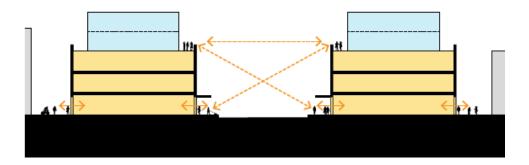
Typical section illustrating how development can respond to and reinforce the role of Oxford Street as an activity street, including active uses at street level, rear laneway activation and roof terraces above the street wall
